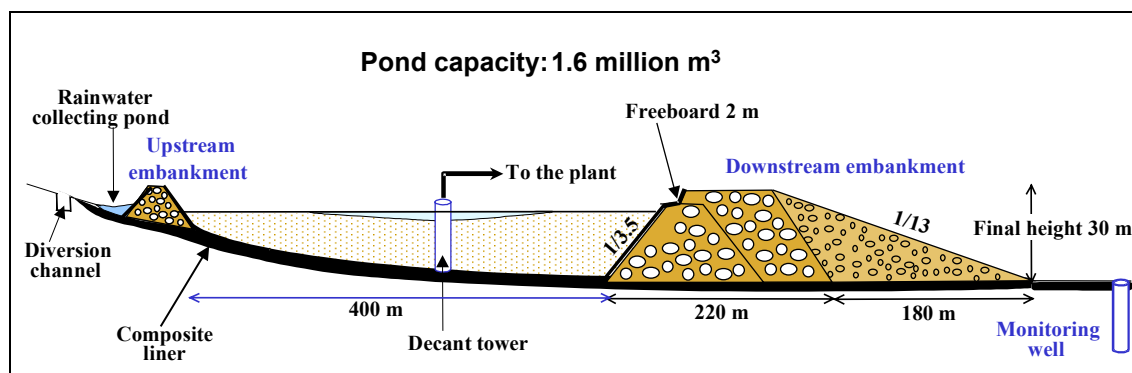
Cross-sectional drawing of Ovacik tailings pond [56, Au group, 2002]
